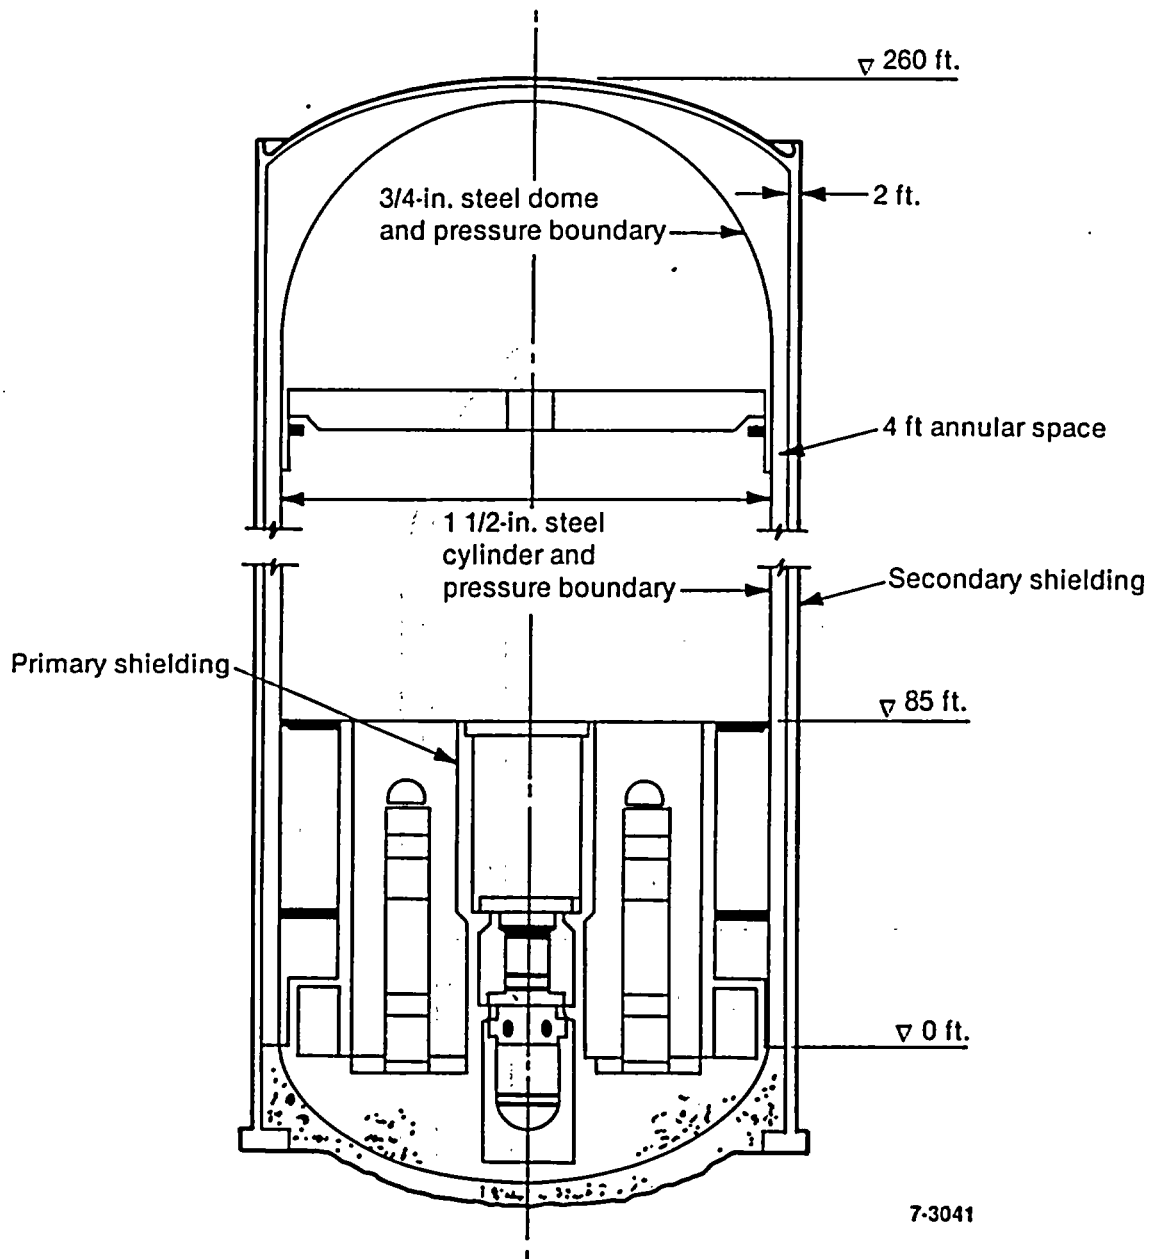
PWR steel cylinder containment with reinforced concrete reactor building.
